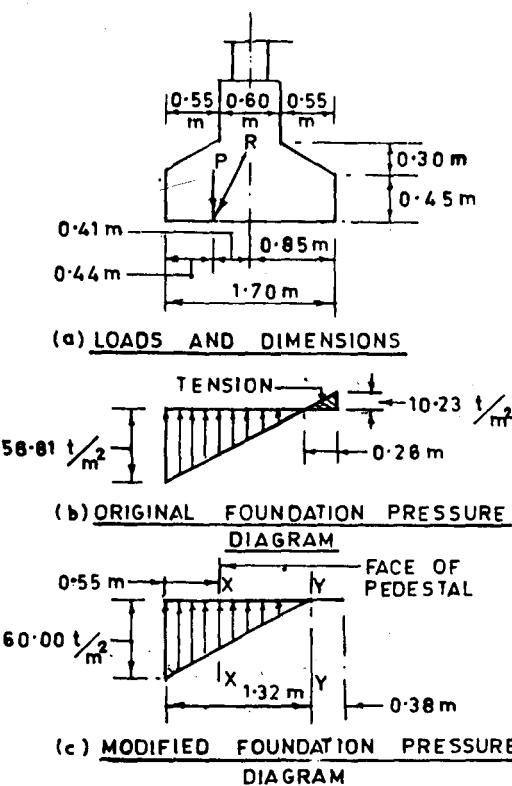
FOUNDATION PRESSURE UNDER RAFT (Example 21.1)
